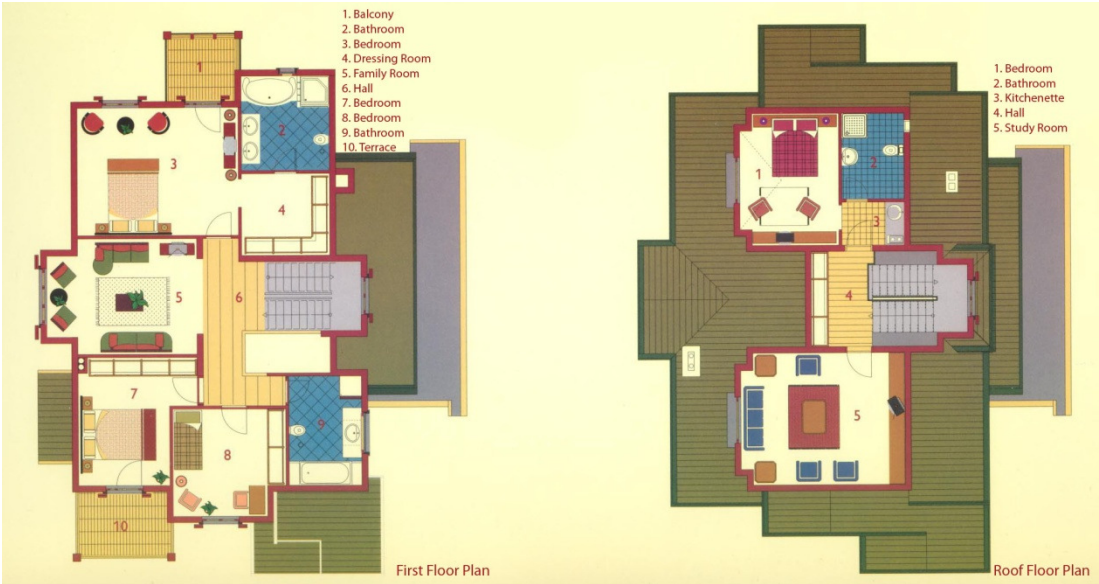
First and roof floor plan of semi-detached villas (Angora Evleri Advertisement Booklet)
